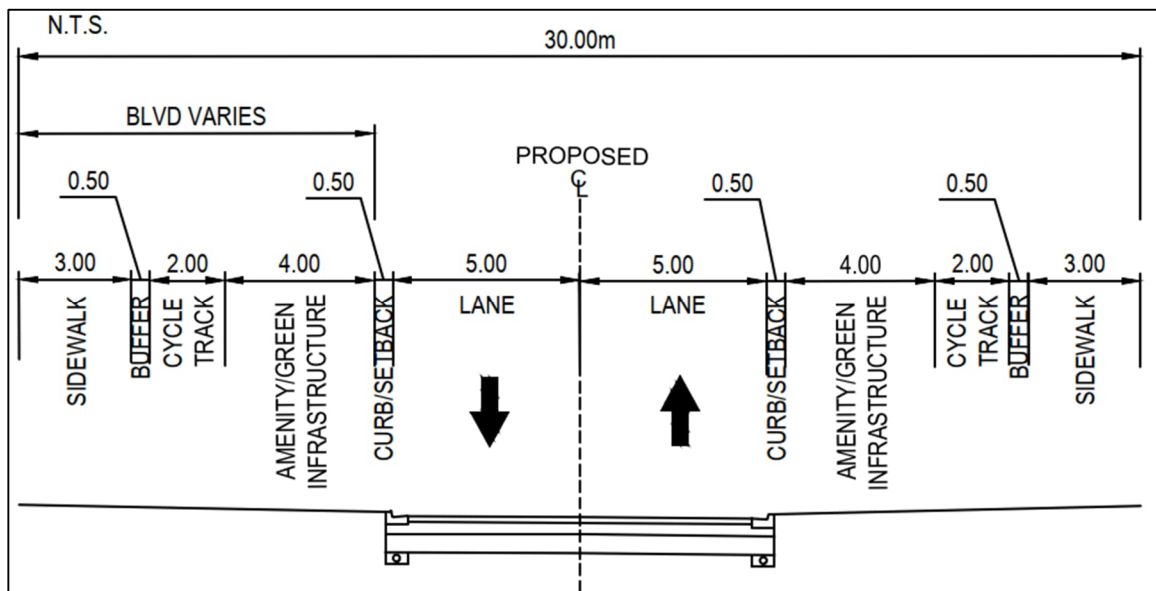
Lake Shore Boulevard West Improvements, West Leg at Silver Moon Drive – Typical Concept Cross-section
